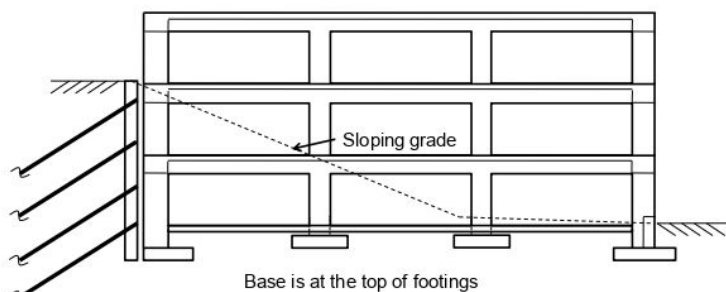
Building with tie-back or cantilevered retaining wall that is separate from the building.
